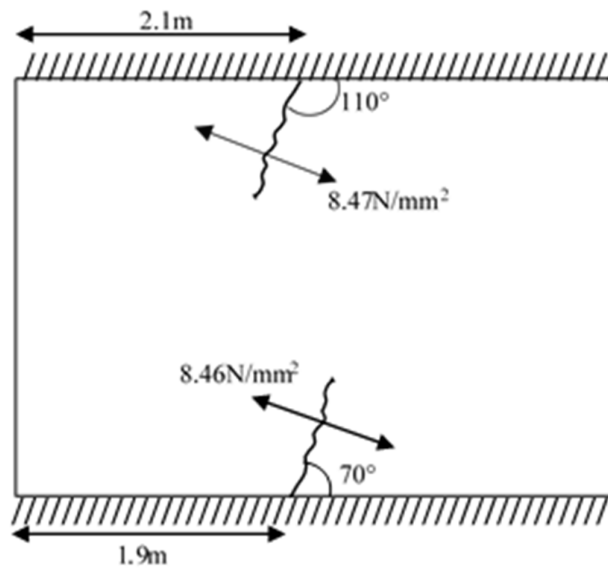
Observed possible crack pattern - 4m wall with top and bottom restraints – top movement
